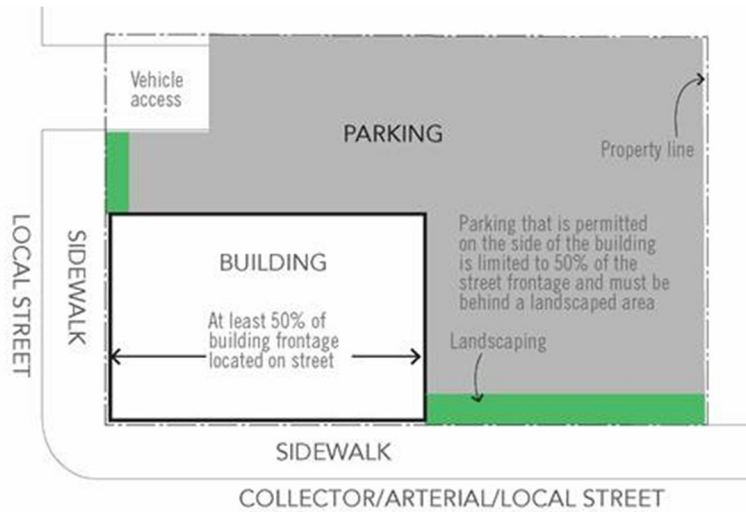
D. Building Placement and Location of Parking, Arterial/Collector/Local Street frontage (typical)
